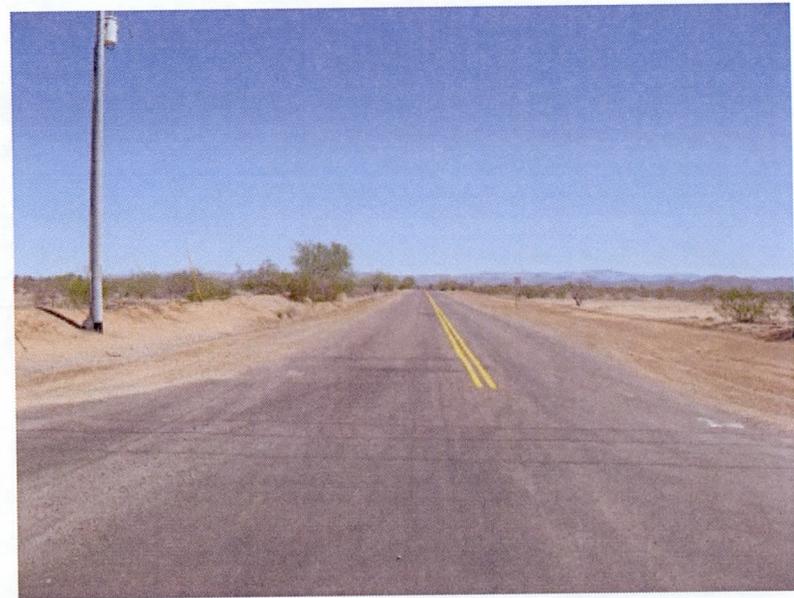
At the intersection of Citrus Road and Pinnacle Peak Road looking north along Citrus Road.
